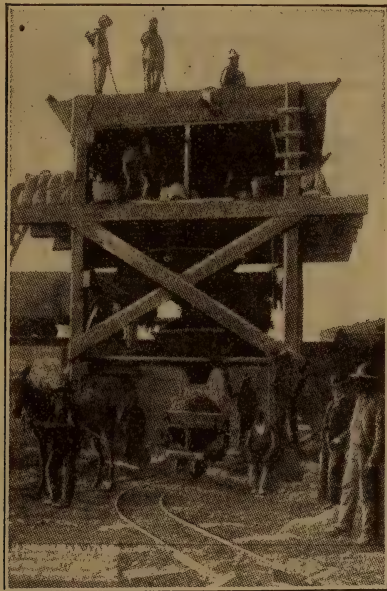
Showing an Arrangement of the Hains Concrete Mixer.
